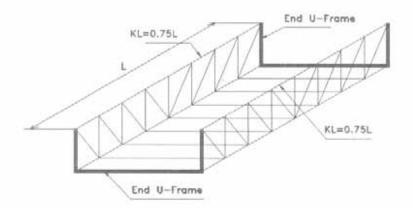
Truss with a Compression Member Laterally Unbraced
